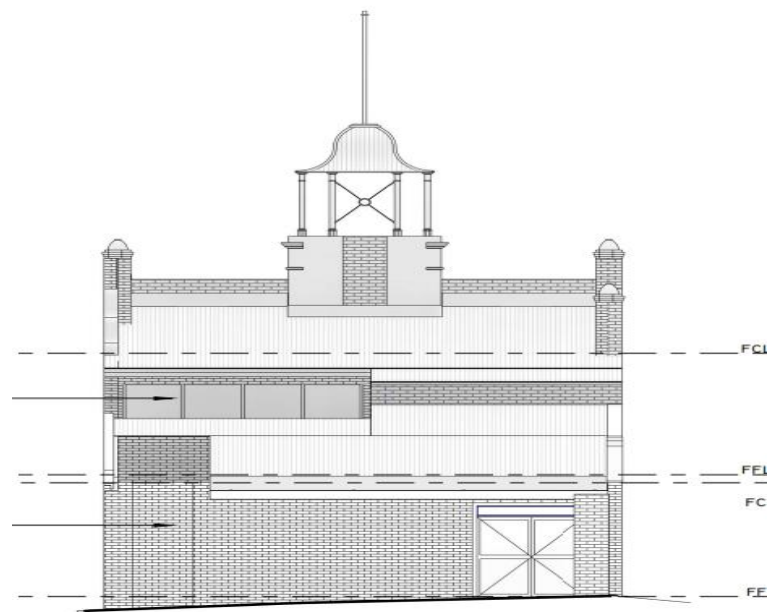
Proposed new works retain the basic form of the original rear elevations (Source: TLA)
